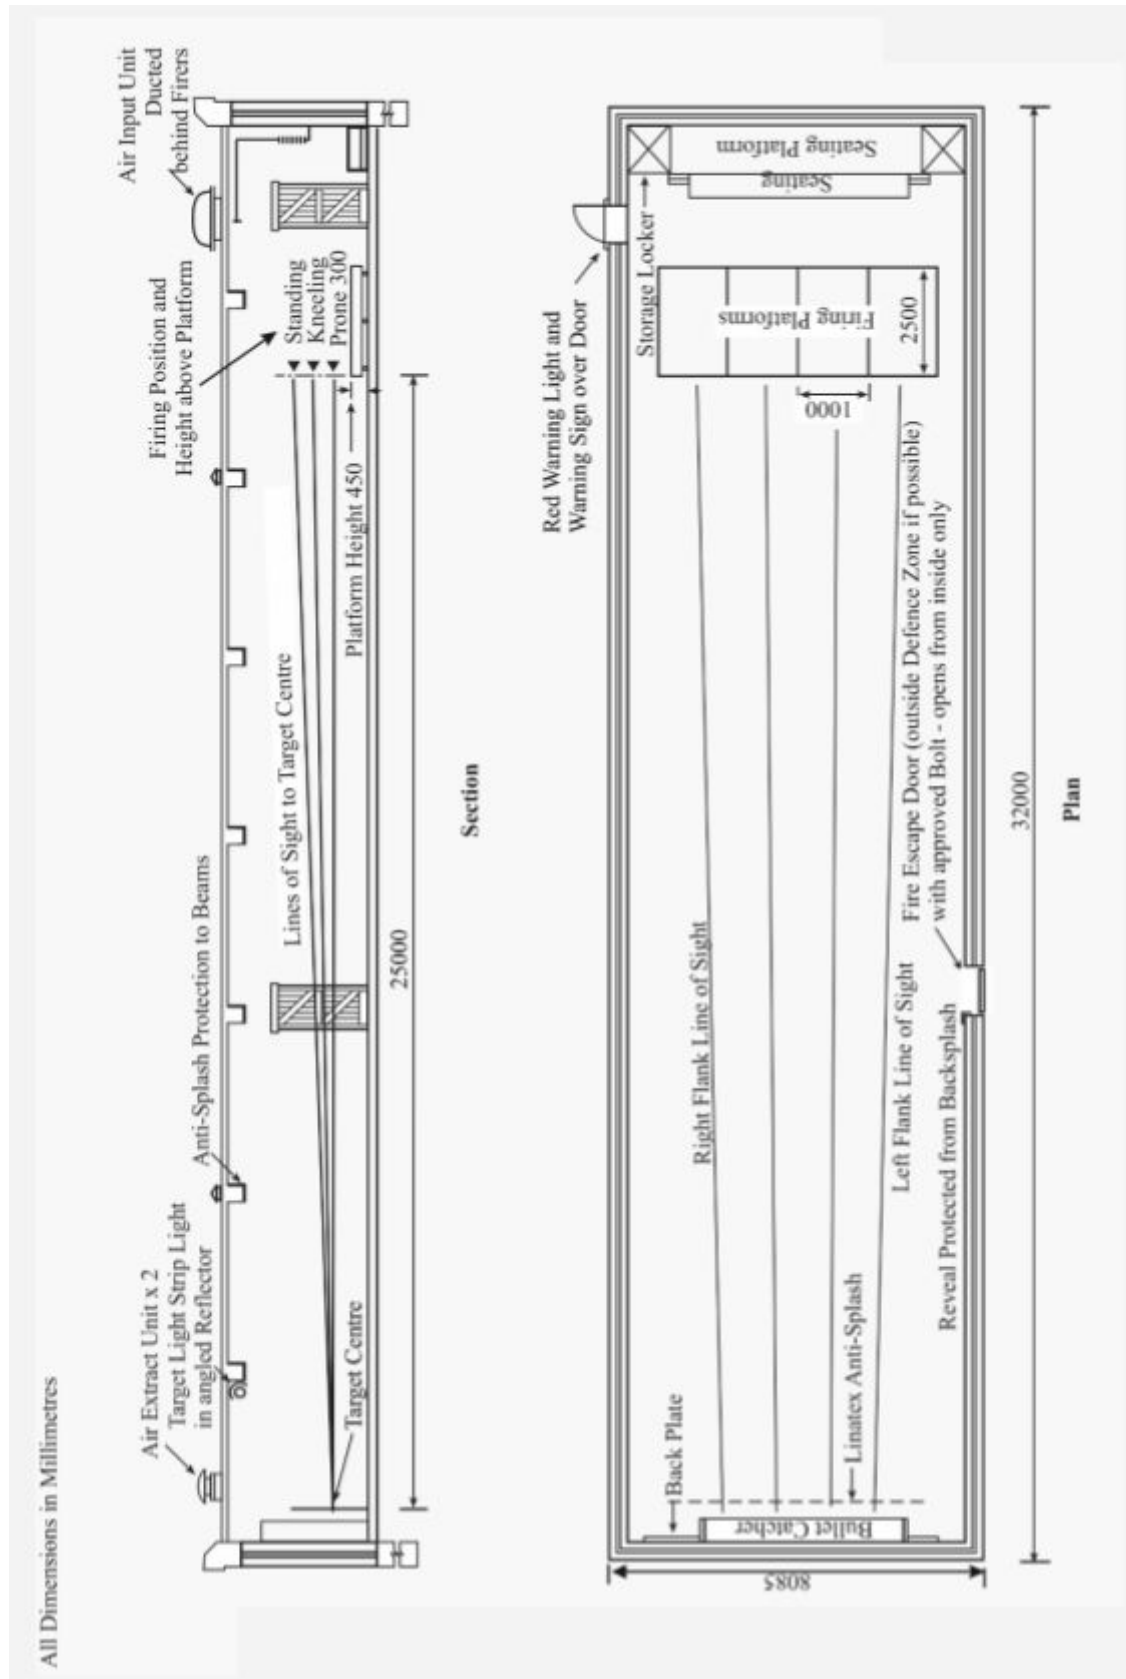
Typical Layout Indoor 25 Metre Range
